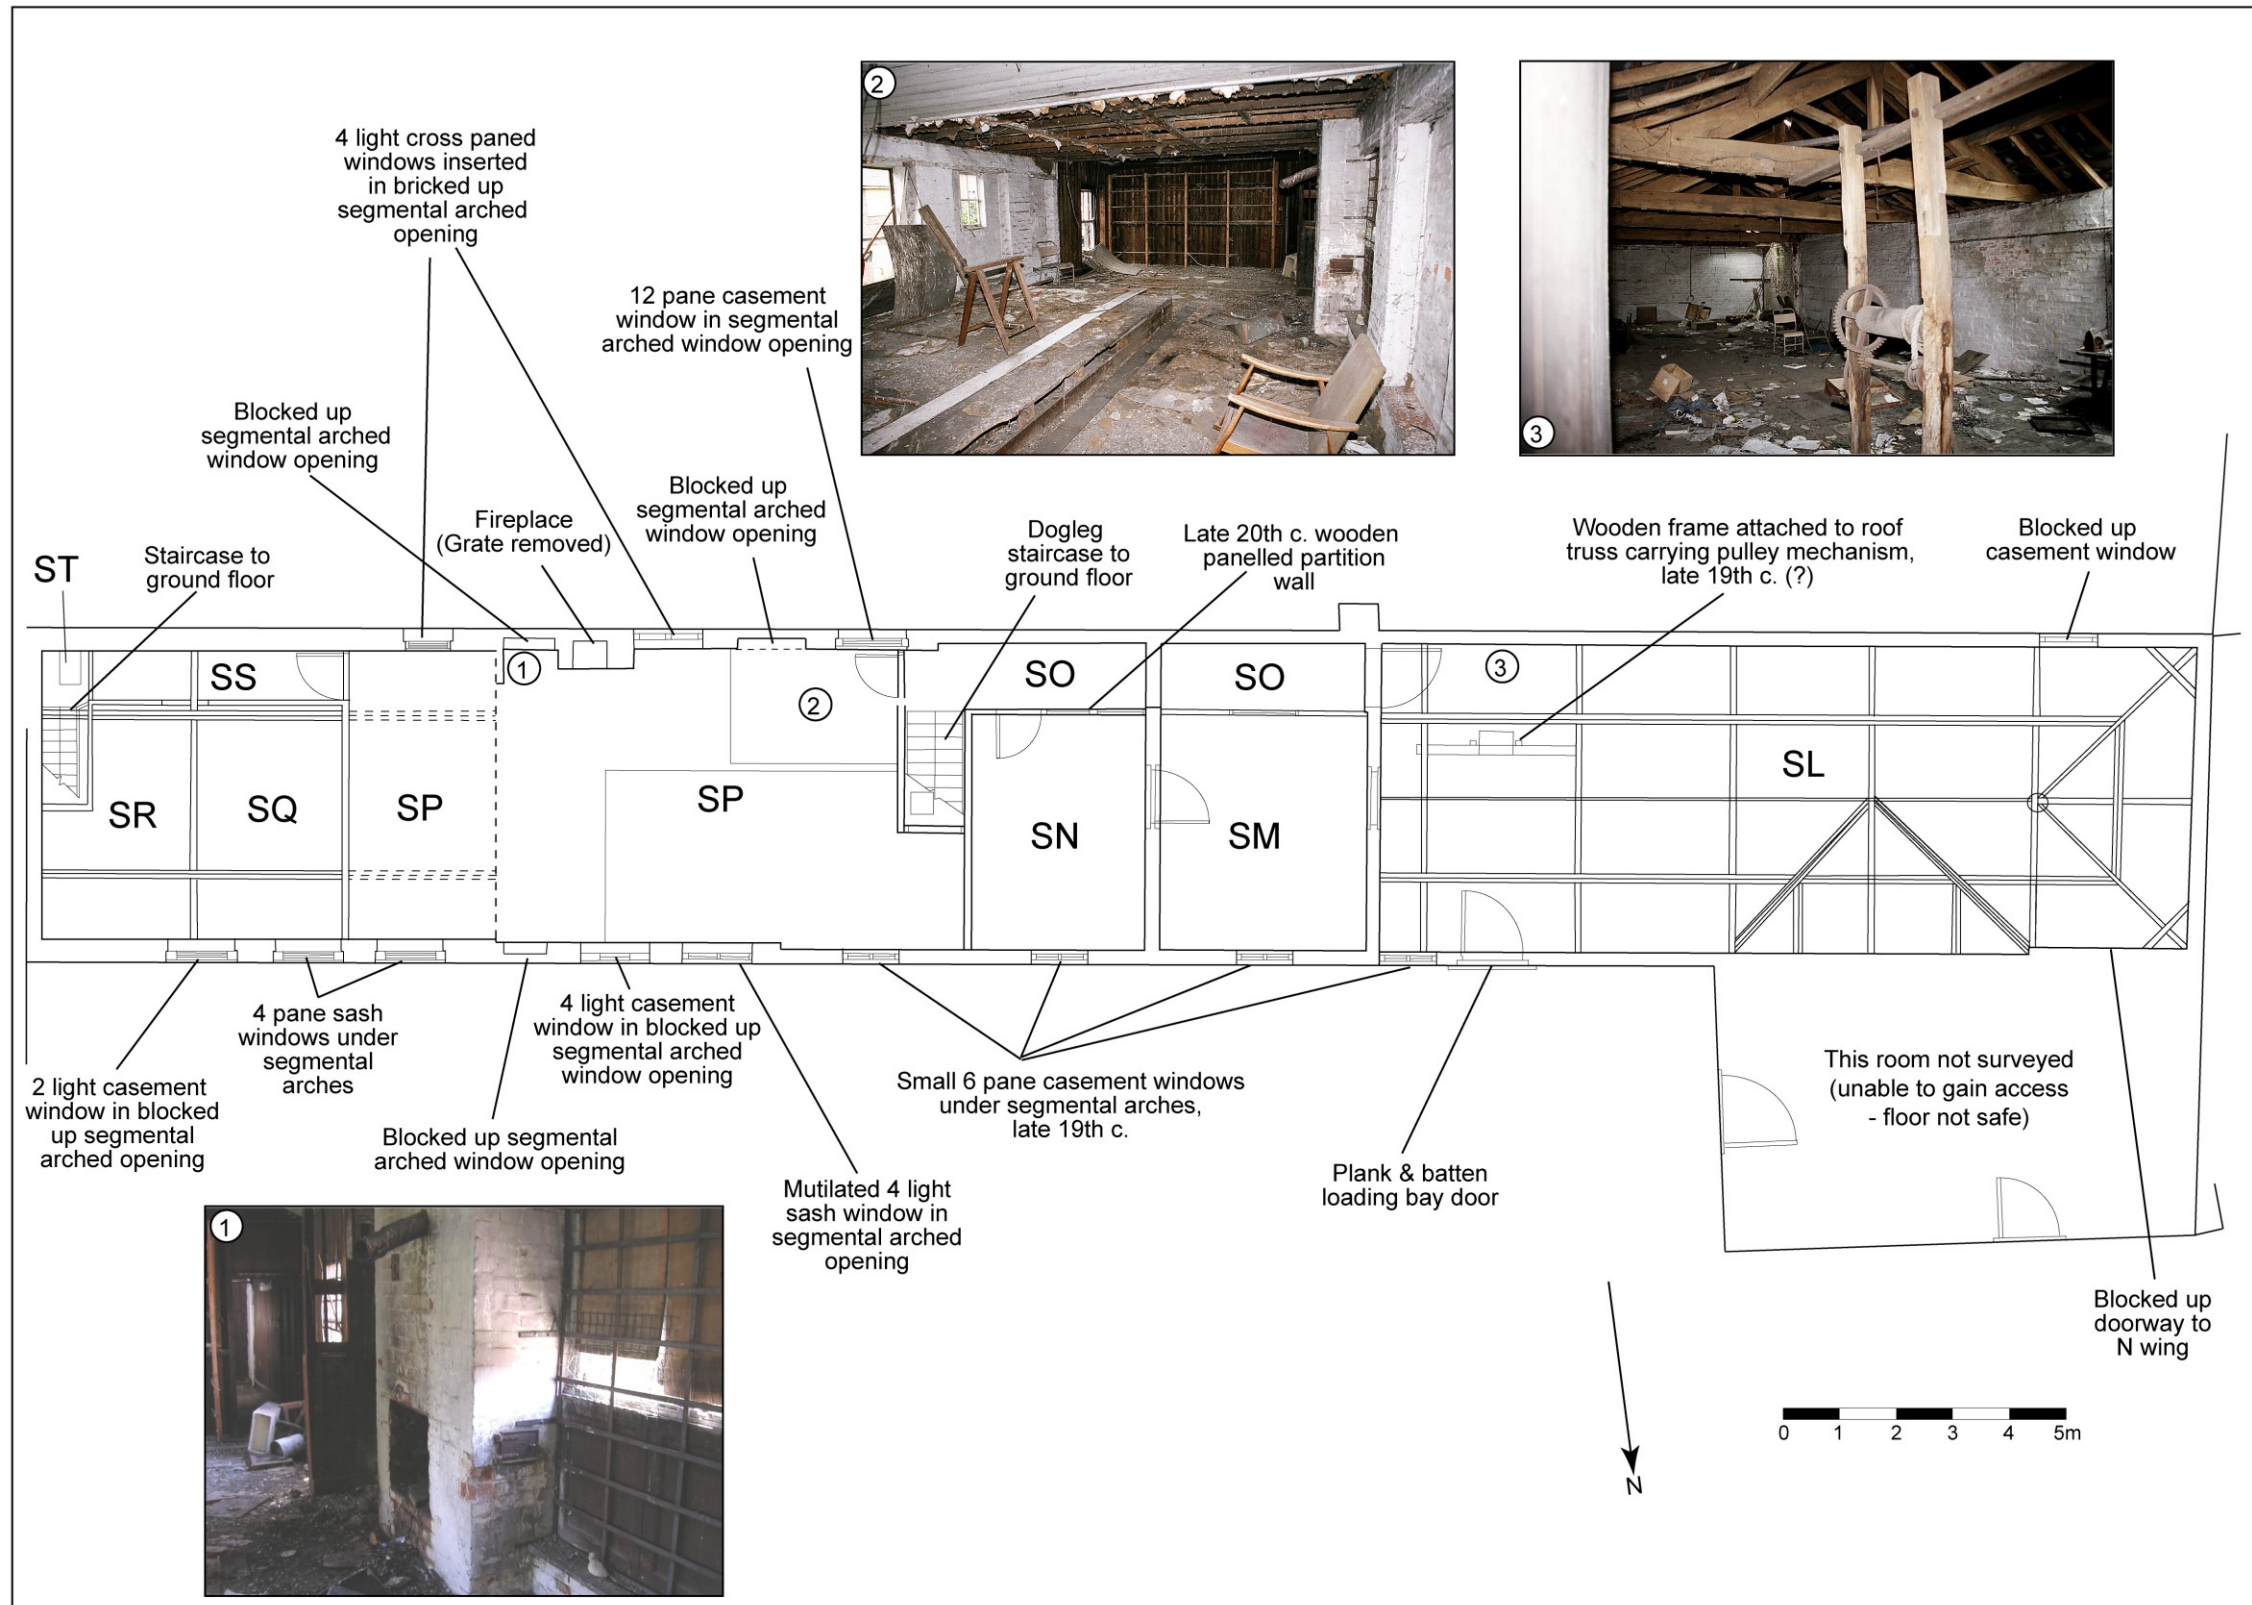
First-floor plan of outbuildings to rear of No. 38 South Street
